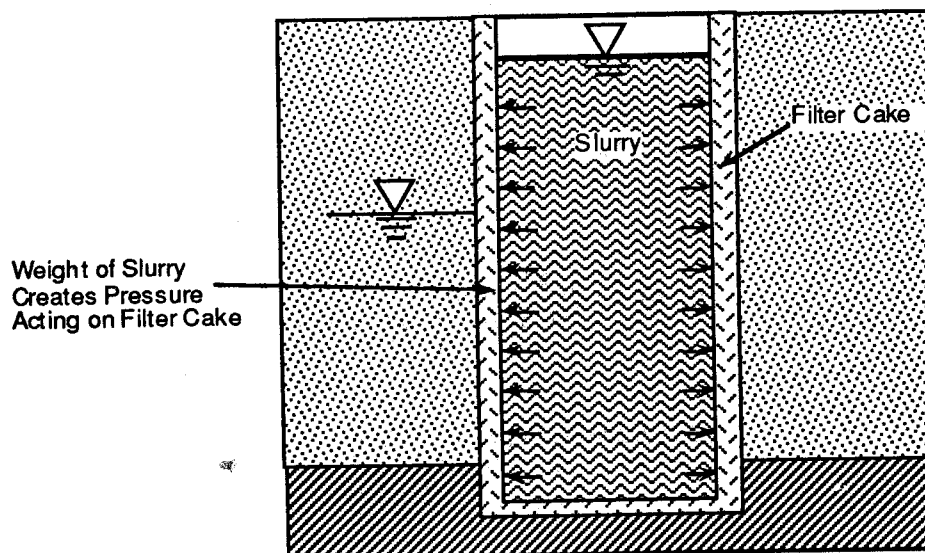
Hydrostatic Pressure from Slurry Maintains Stable Walls of Trench.
